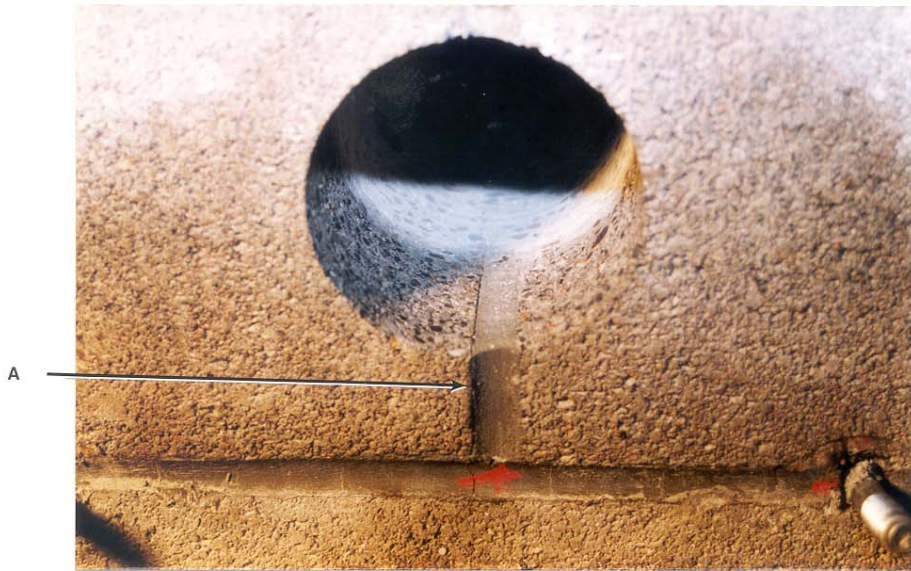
Core hole N2-4, "A" shrinkage or thermal crack in mortar joint extending into the concrete wall.
